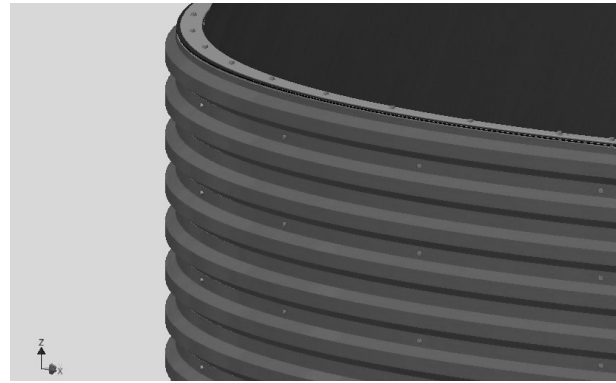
Finished connection of trapezoidal sheet metal and sections [own elaboration]
